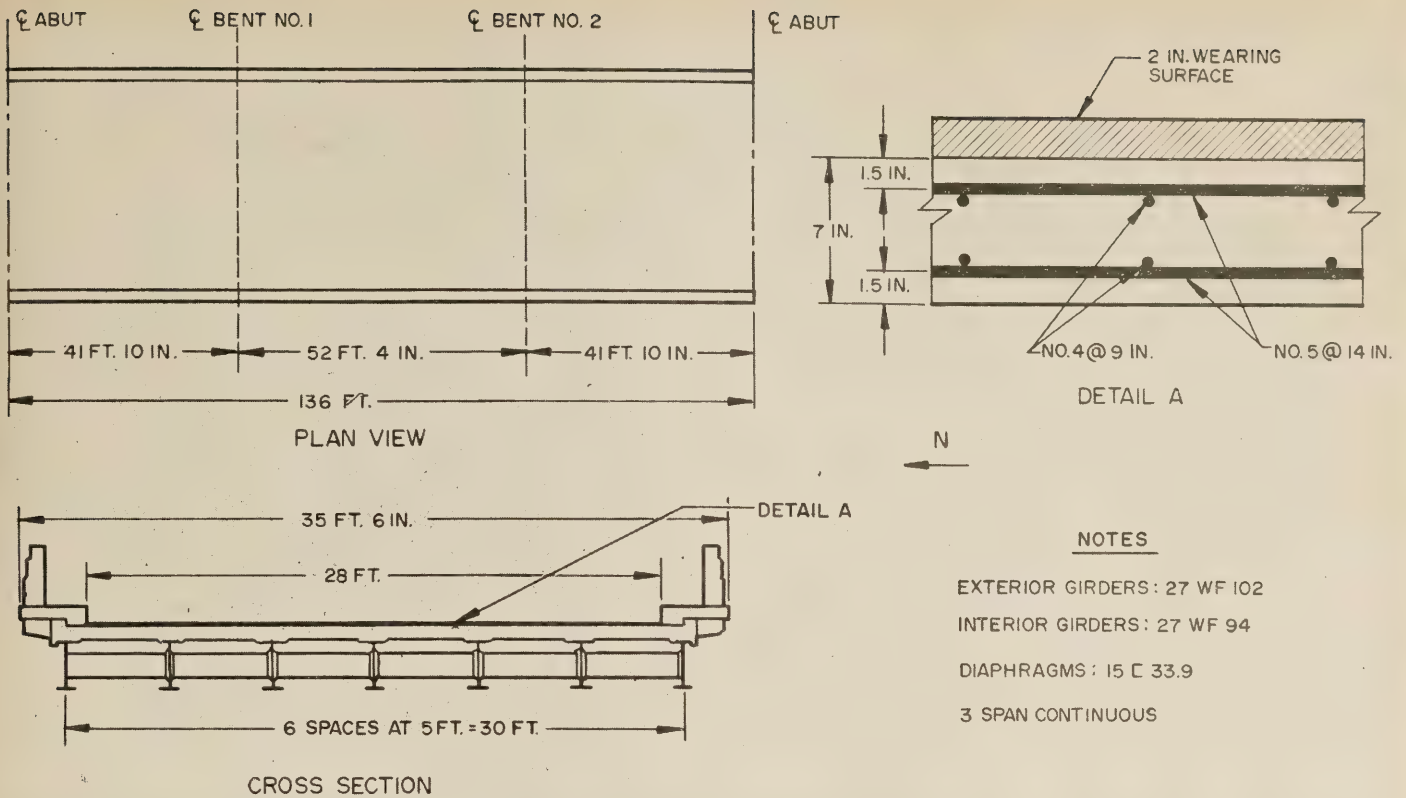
Bridge structure—U.S. 301, Marlboro bypass, southbound.
